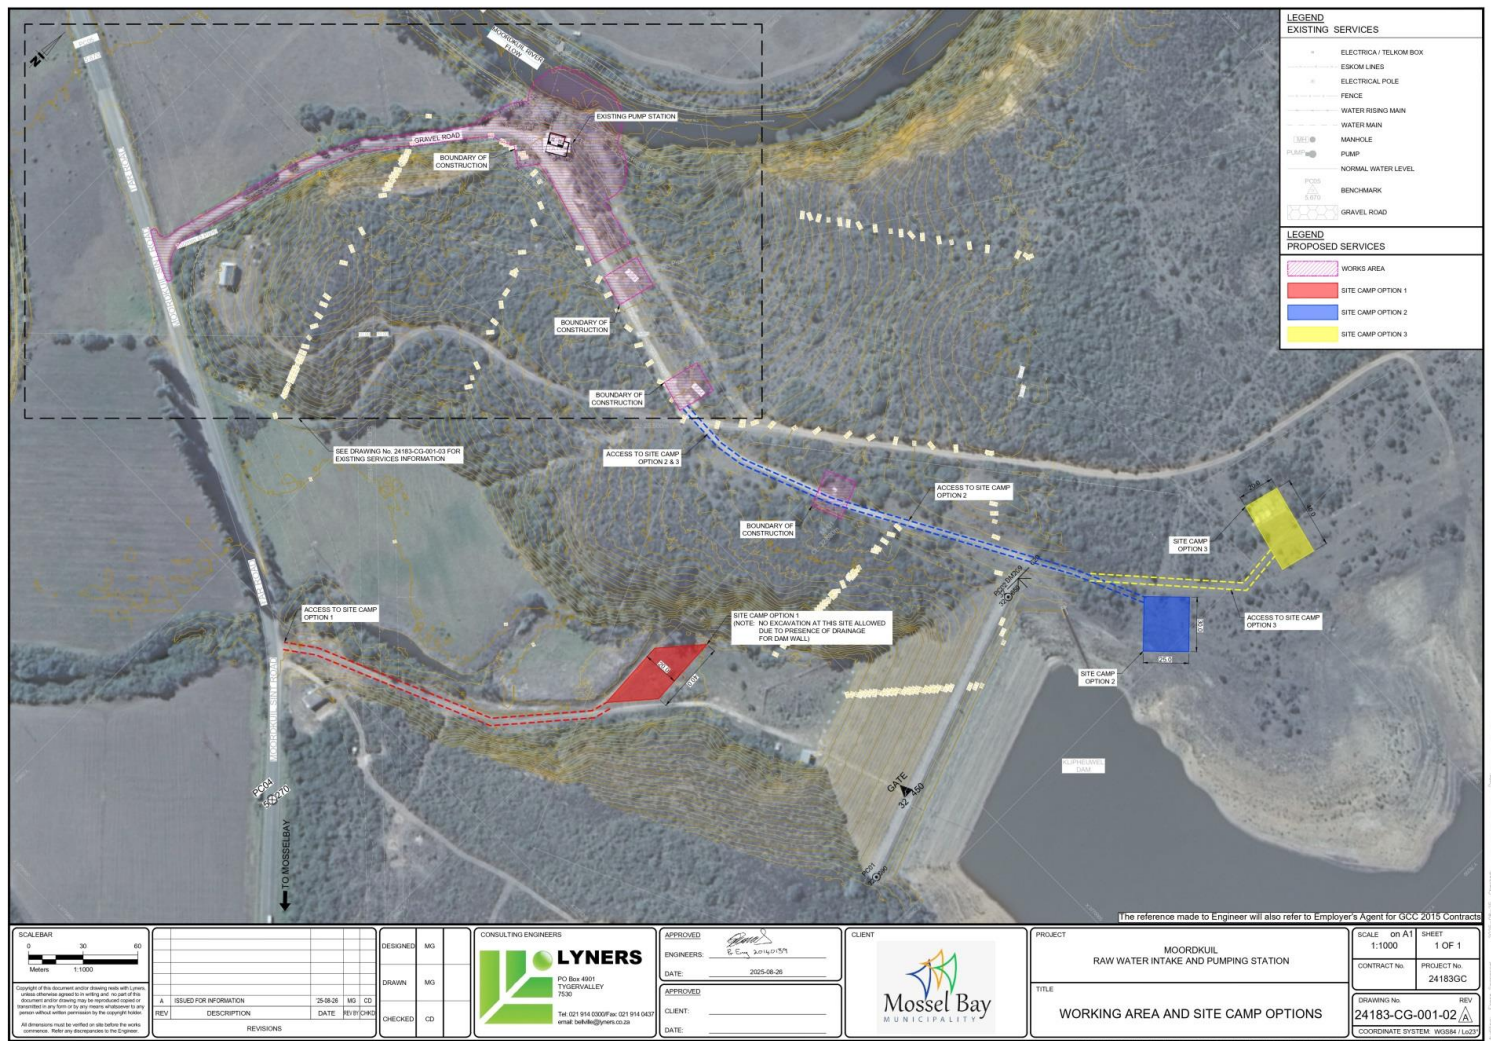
Site development plan (SDP) for the proposed scope of works and alternative site camp locations under Alternative layout A.
